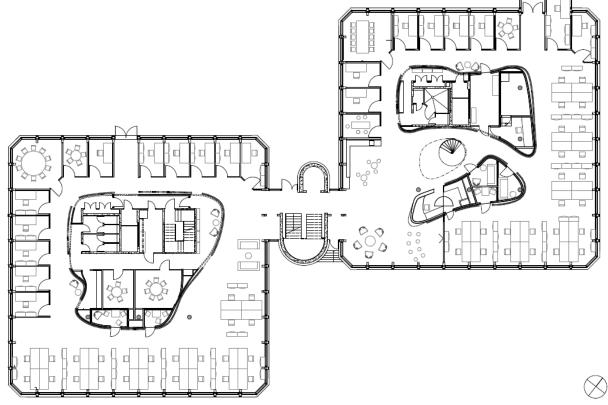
Typical floor plan. Illustration: Snøhetta.
